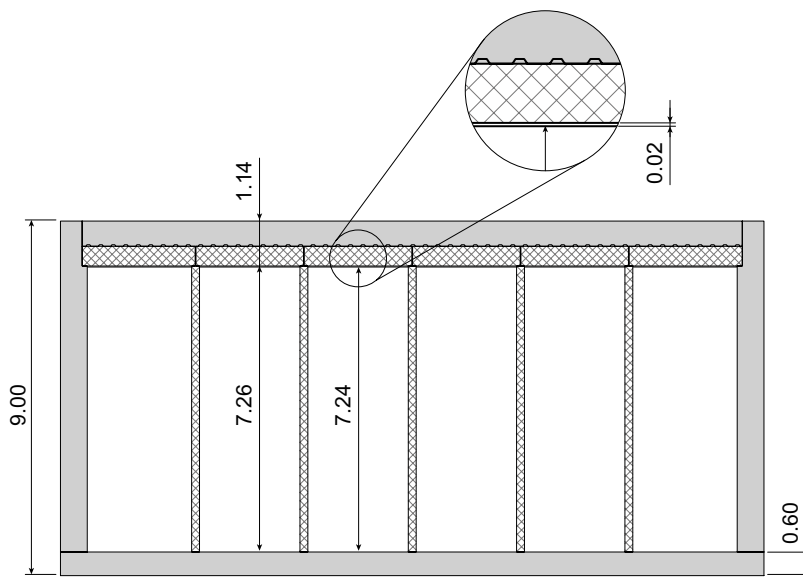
Schematic cross-section of the inner walls in 2BMA. Layout 2021.
